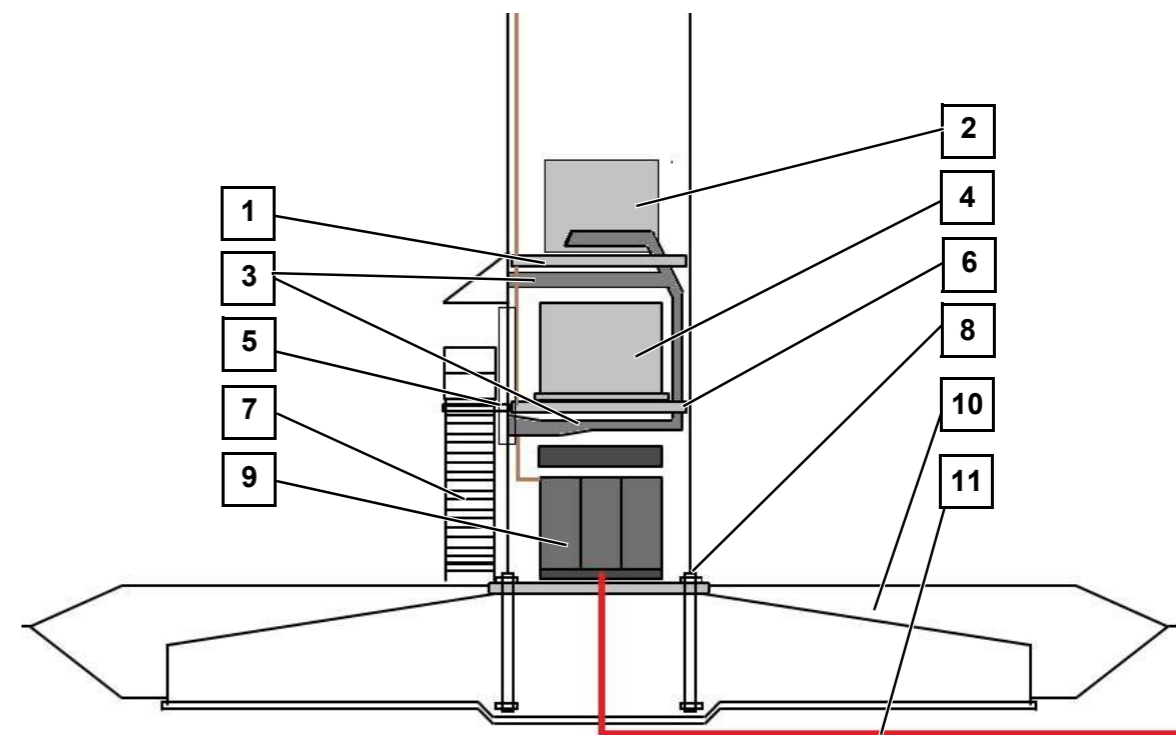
Sectional view of the tower base, variant with transformer inside tower (TIT)
